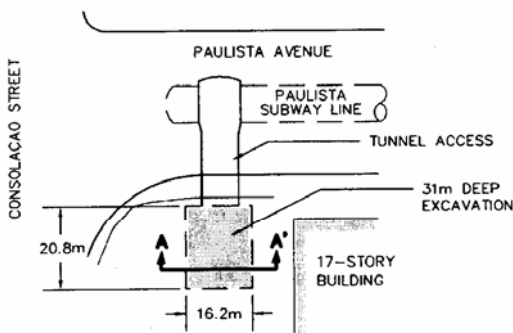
Plan view of the Poço Salas Técnicas Excavation.
